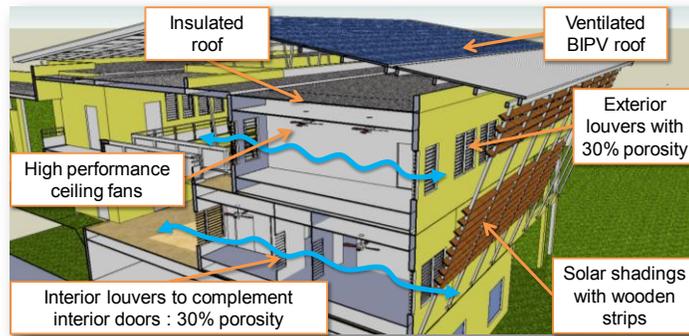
Main features of the Enerpos building: passive design such as cross natural ventilation, solar shadings and insulated roof.
